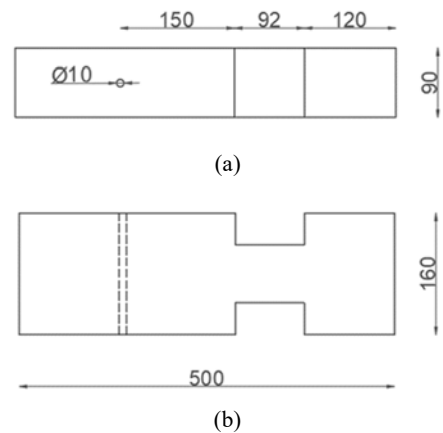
Specimen detail for dowel location a) top view and b) side view
